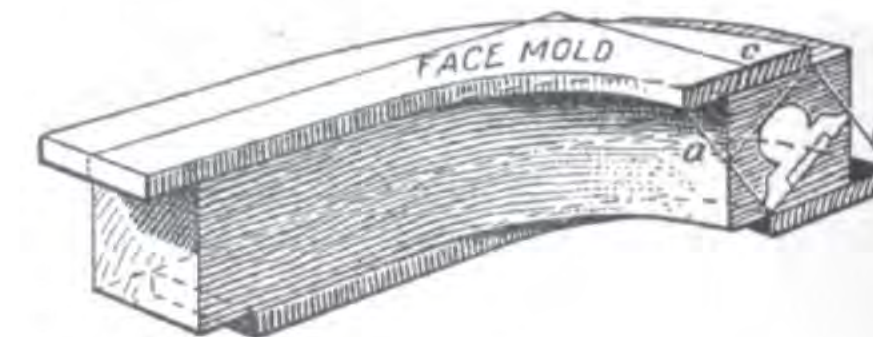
Isometric View, Showing Method of Applying Face Mold to Plank for Purposes of Cutting the Material for the Wreath.
